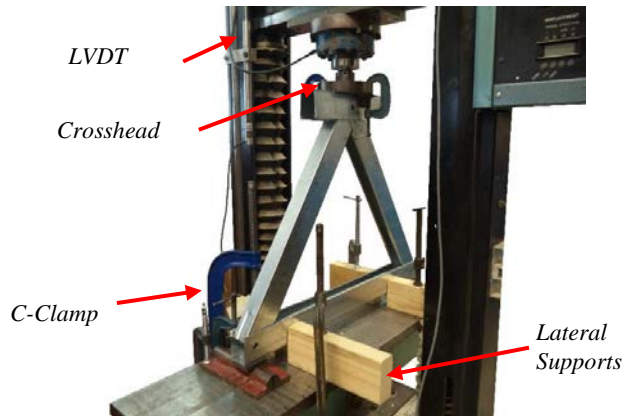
Truss panel specimen mounted on Instron Universal Testing Machine
